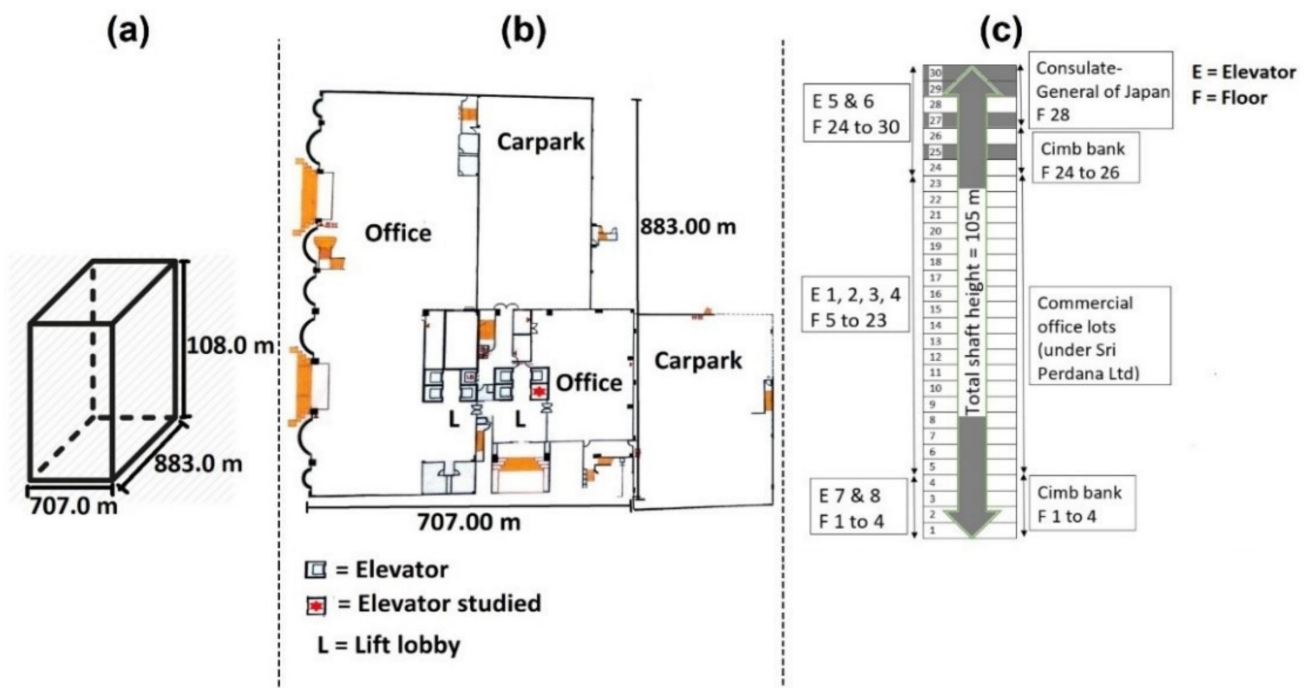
HO (a) building dimensions, (b) building floor plan, and (c) function and operating lift of different floors. Shaded floors are vacant during the study.
